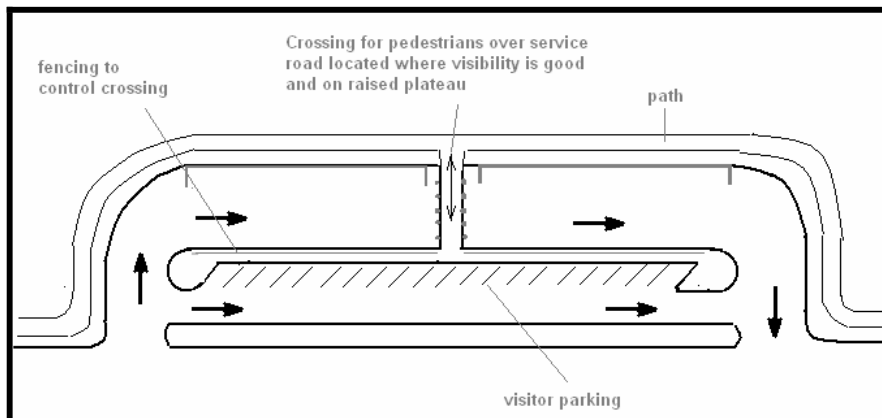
Off road parking (note one way traffic flow and path on school frontage)
